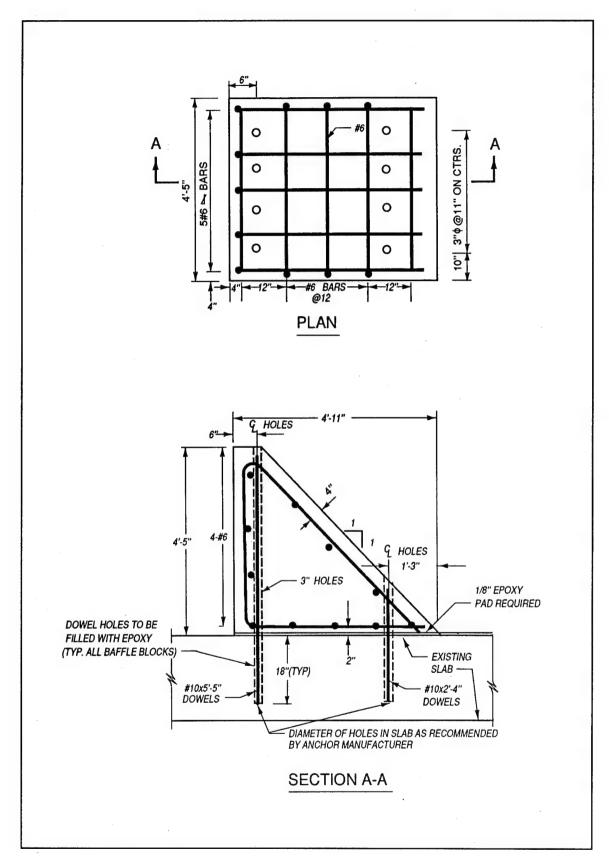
Design details for precast concrete baffle blocks, S-65 and S-65A structures, Central and South Florida Flood Control Project
